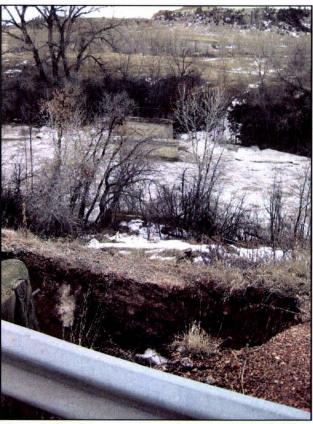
Looking south-southeast across subsidence pit to Carney Mine trestle abutments in Tongue River.
